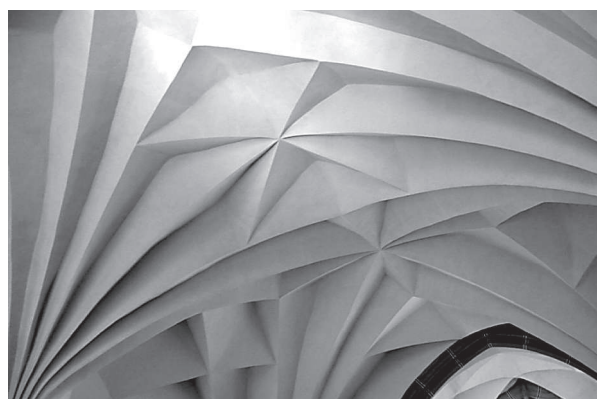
Cell vault in the second floor of the Albrechtsburg at Meissen (Germany). The folded surface of such vaults are built in brick masonry (D. Wendland)
